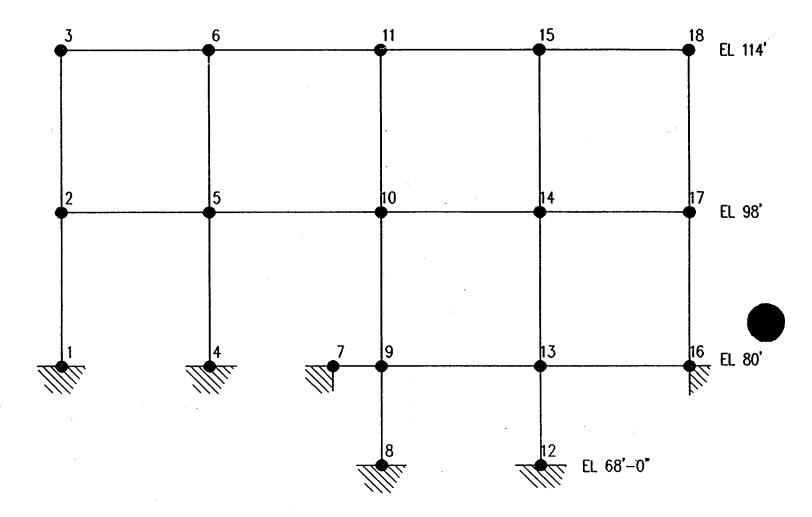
Primary Auxiliary Building Section B-B Through Structure
